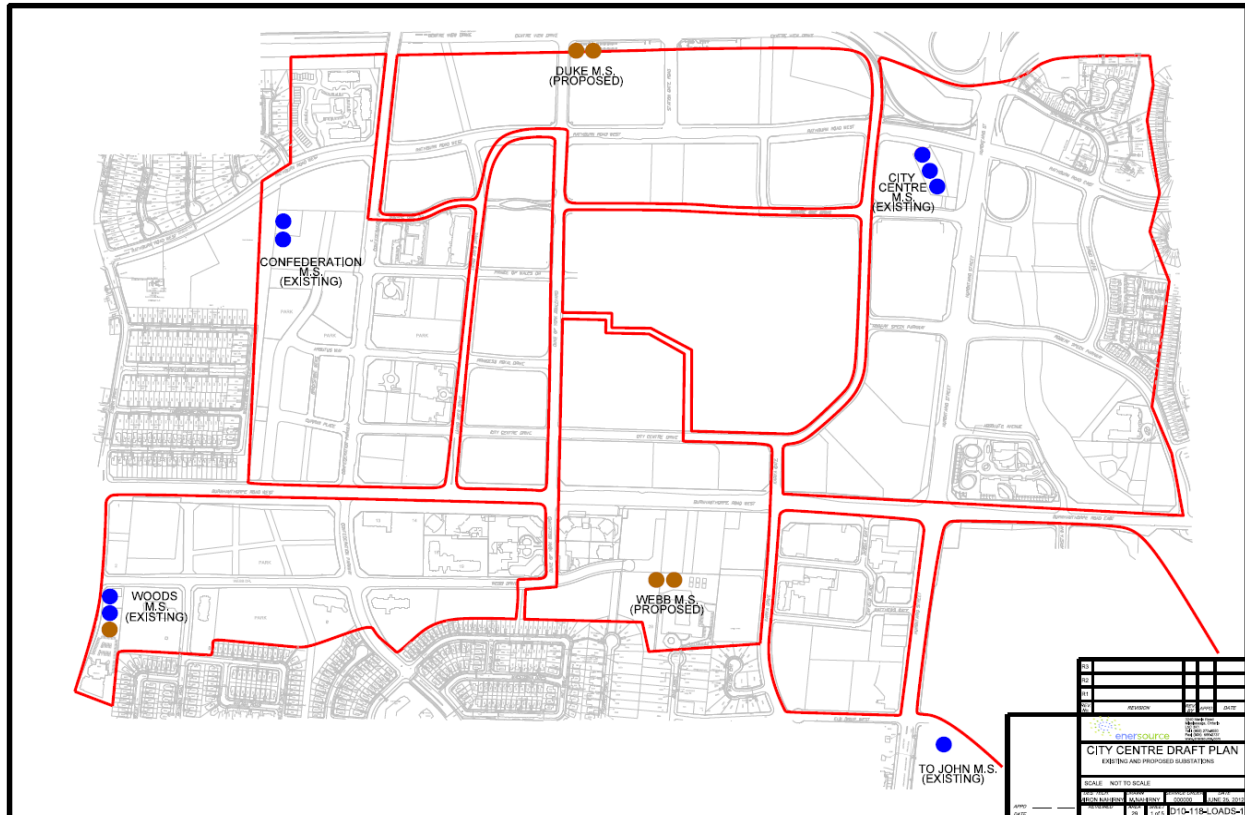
Existing and Proposed Substation Locations in the Downtown Core
